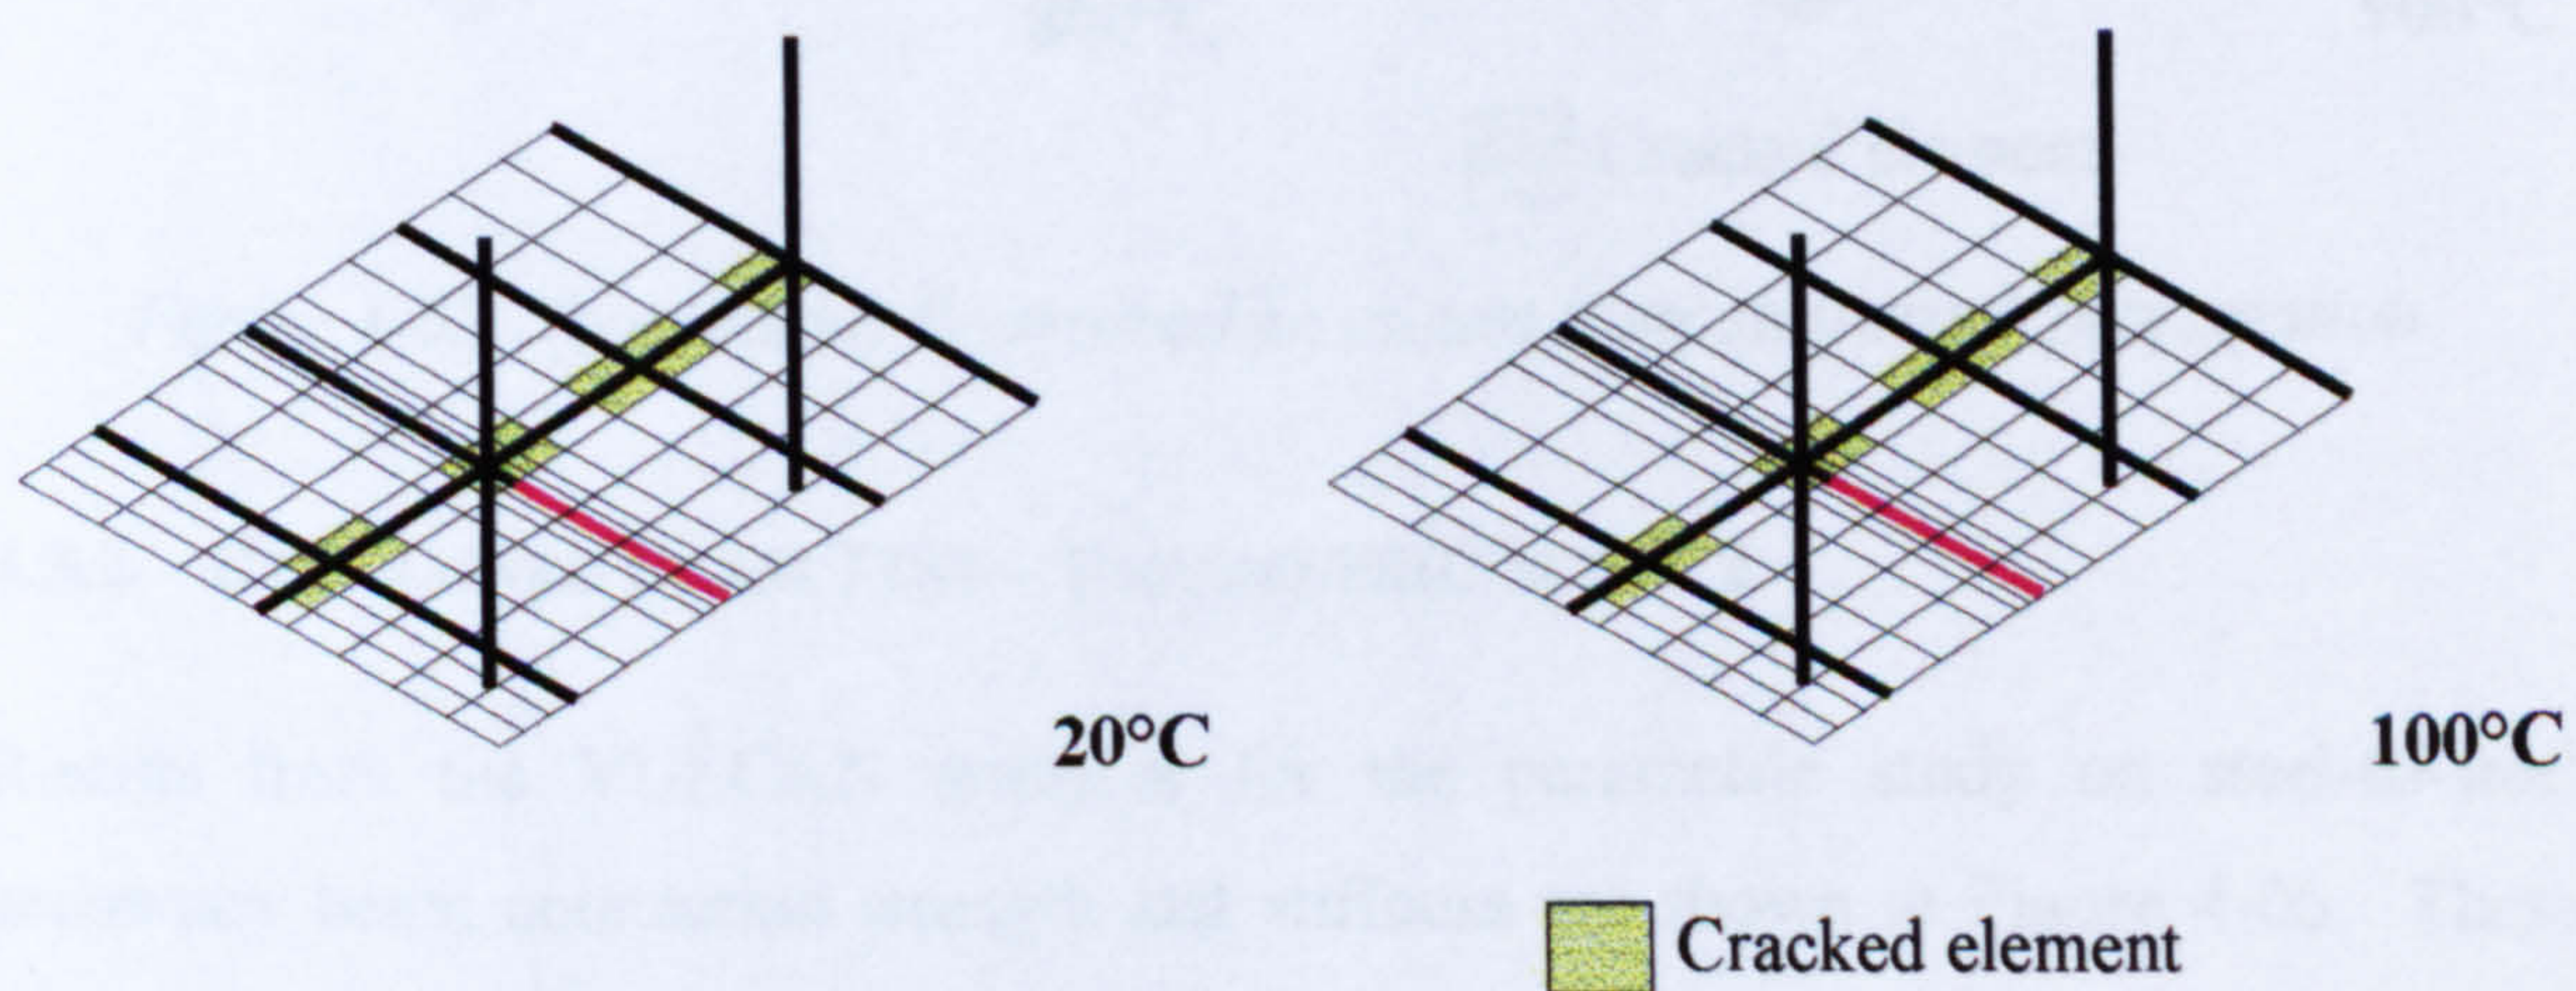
Restrained beam test floor slab crack propagation
